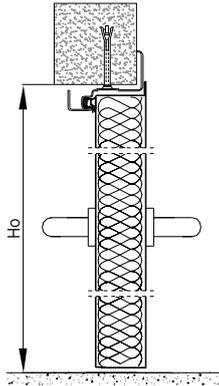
Installation of the single-leaf door with the corner frame in a masonry wall, vertical cross-section
